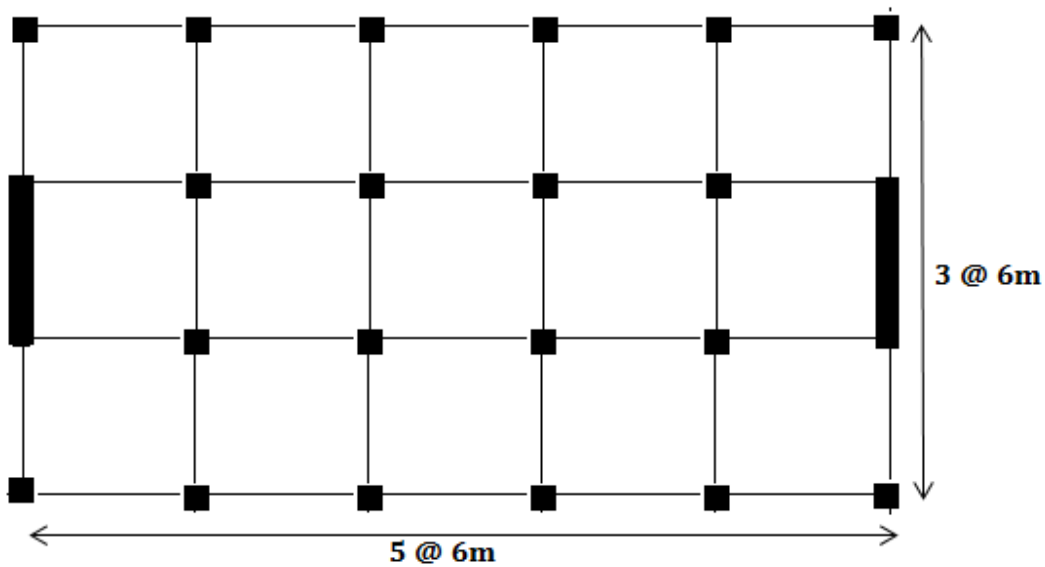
Plan view and dimensions of the case studies - with link beams
